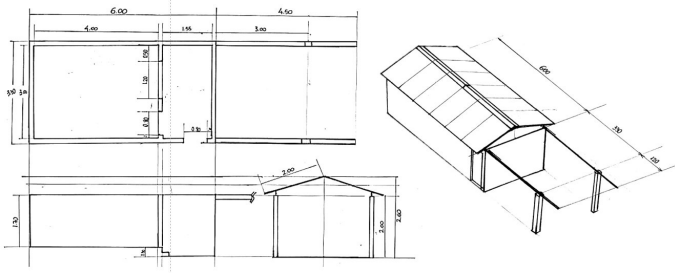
Floor plan (left) and isometric view (right) of the observatory.
